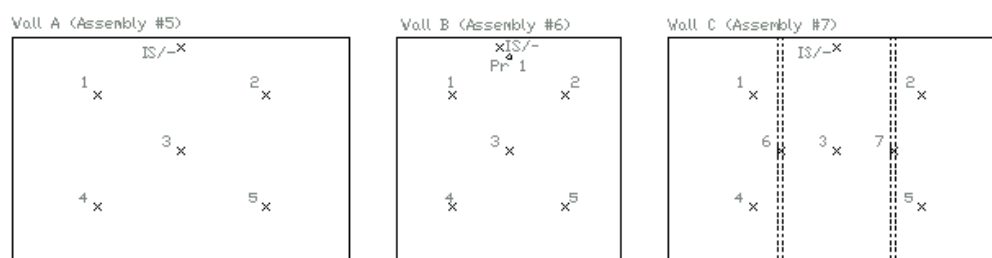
Thermocouple positions (elevation view) on wall assemblies – Test#2
